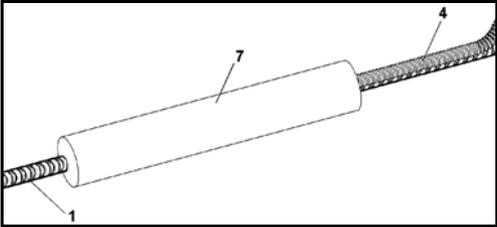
The final look of the strain sensor after application of protection coatings and physical protection of measurement area made of cement mortar: 1 - reinforcement bar; 4 - PE tube for cable protection; 7 – cylindrical shaped protection of measurement area made of cement mortar with the addition of acrylic emulsion
